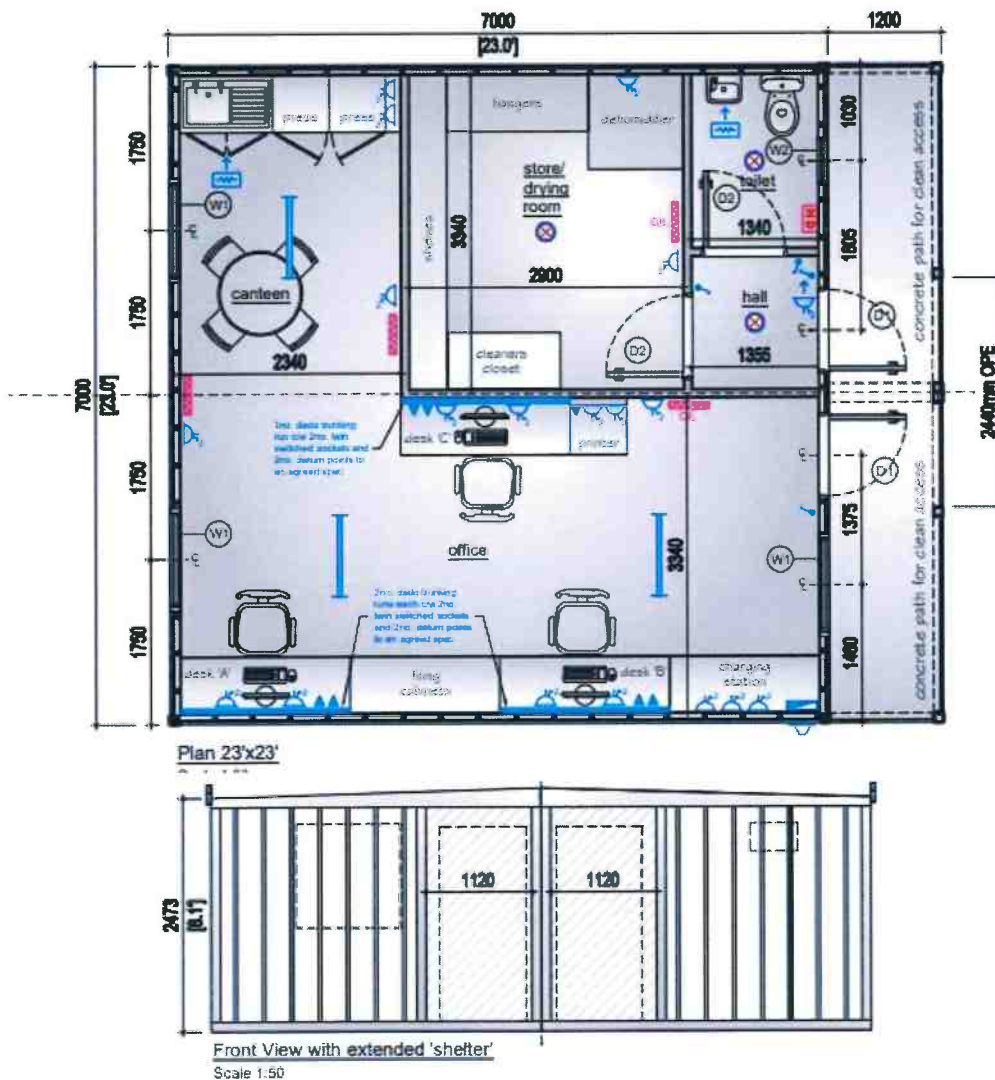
Proposed Floorplan and Elevation of the Portacabin
